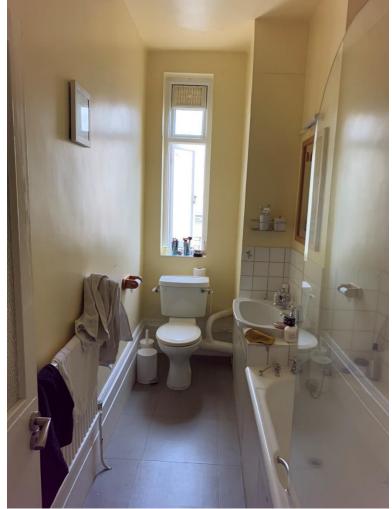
Existing Bathroom showing dropped ceiling and partitions
